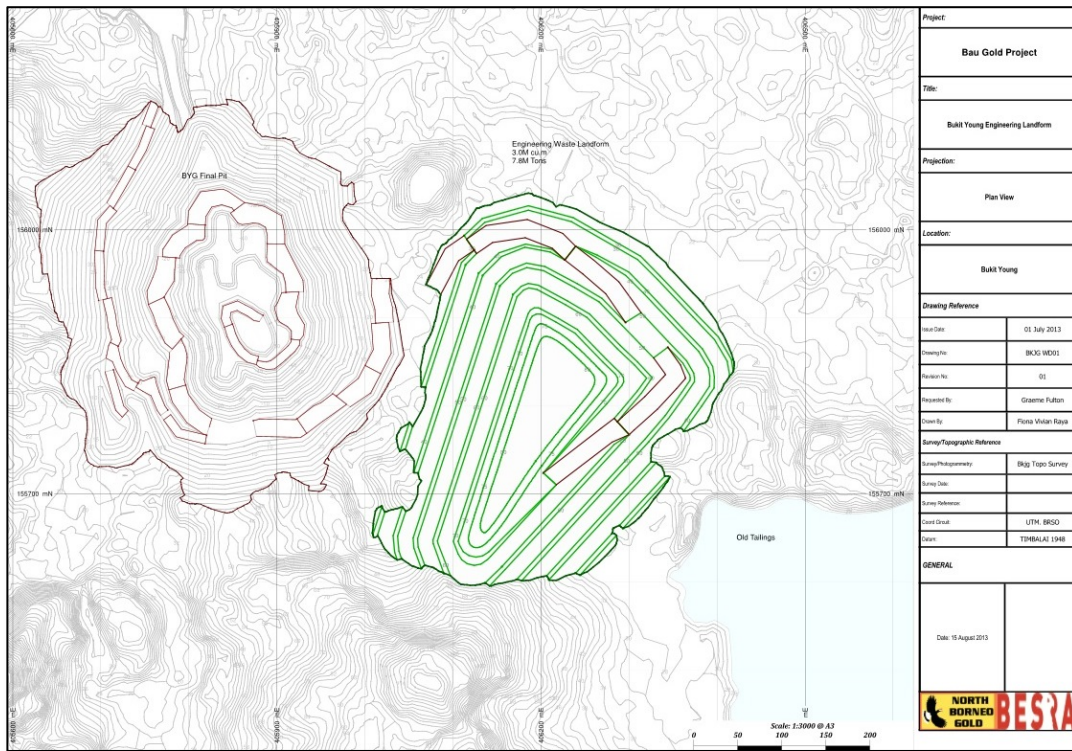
BYG-Krian: Pit & Waste Landform Design
